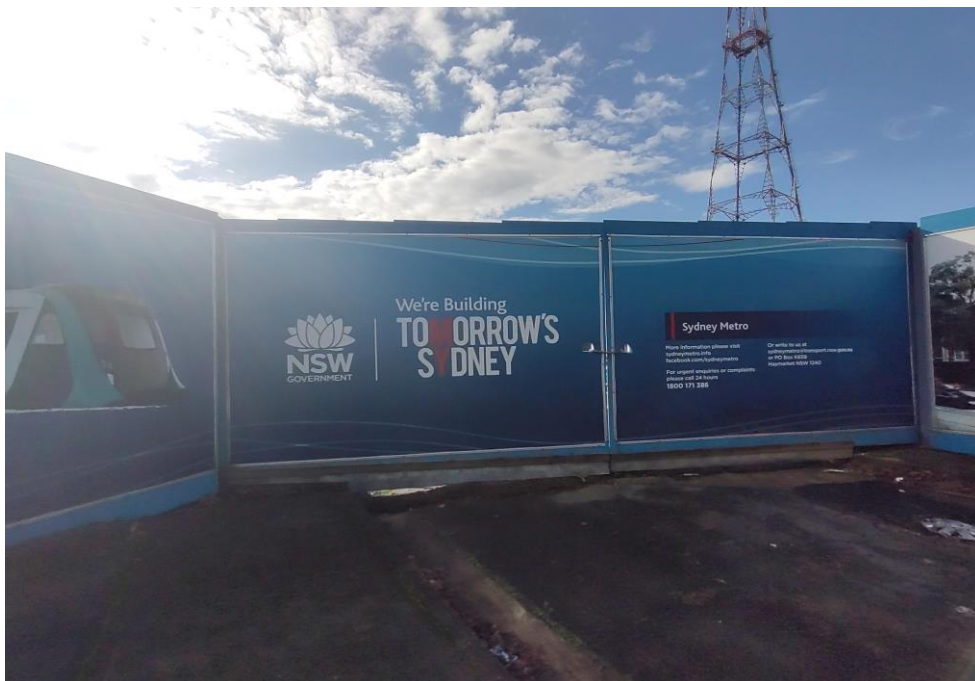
Sydney Metro construction site observed at southern side of Nelson Street
